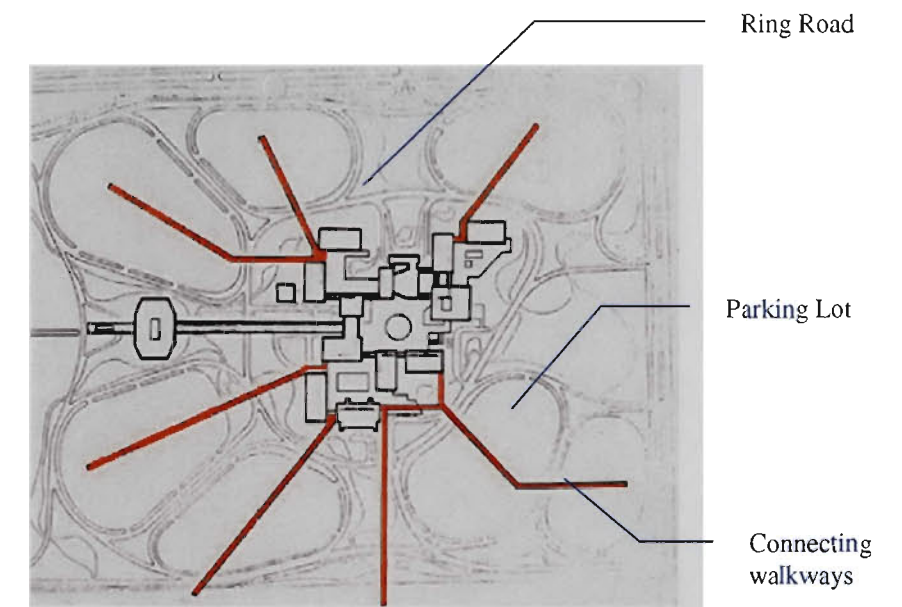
Plan shows connections between parking facilities and campus from the 1970s Master Plan.
